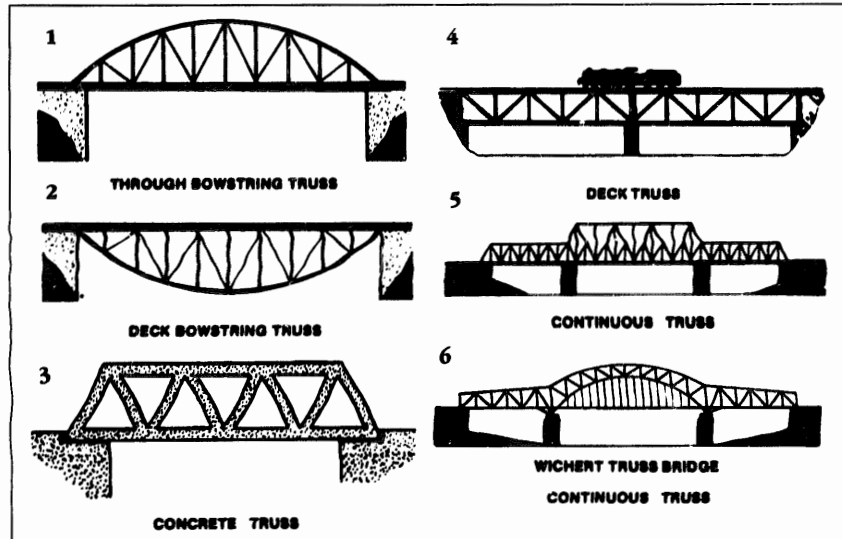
Basic truss bridge types. 1) A through bowstring truss, where all posts and diagonals are tension members; 2) A deck bowstring truss, this is not a true bowstring, but a variation on a Pratt truss; 3) A through Warren truss, recognizable as being made of concrete by the thickness of the members and the lighter tone; 4) A continuous span, deck-type Howe truss; 5) A continuous span through truss, centered on a Baltimore truss, which gives the longer central span added strength; 6) The Wichert truss is actually a hybrid structure. The central span is suspended beneath a cantilevered truss arch.
